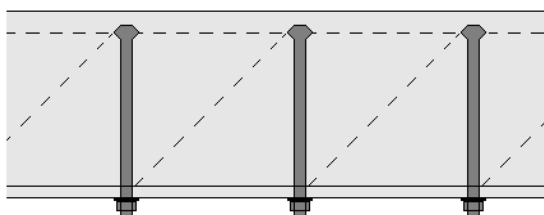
Strengthening by undercut anchors shown in a truss model, after Bohlin and Olofsson (2010).
